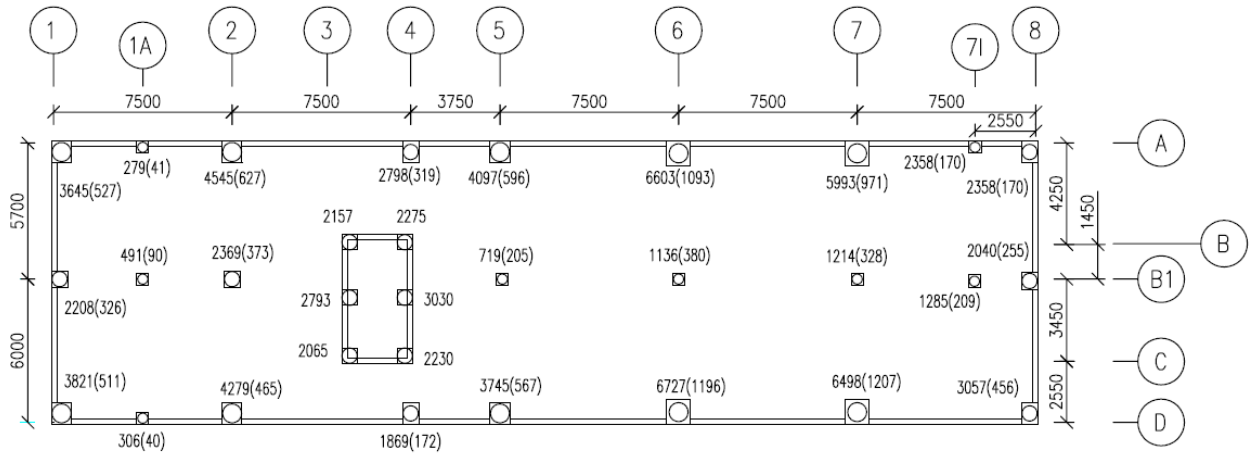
Plan view of column locations and the mass borne (live load in parentheses)
